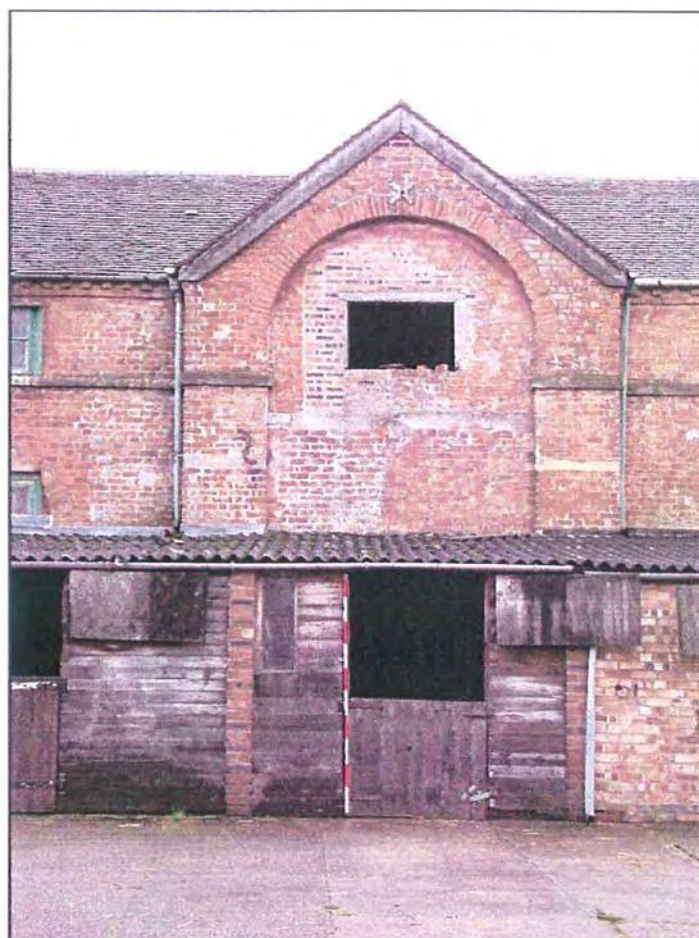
North section, north gable, showing new door and rebuilt top of gable
